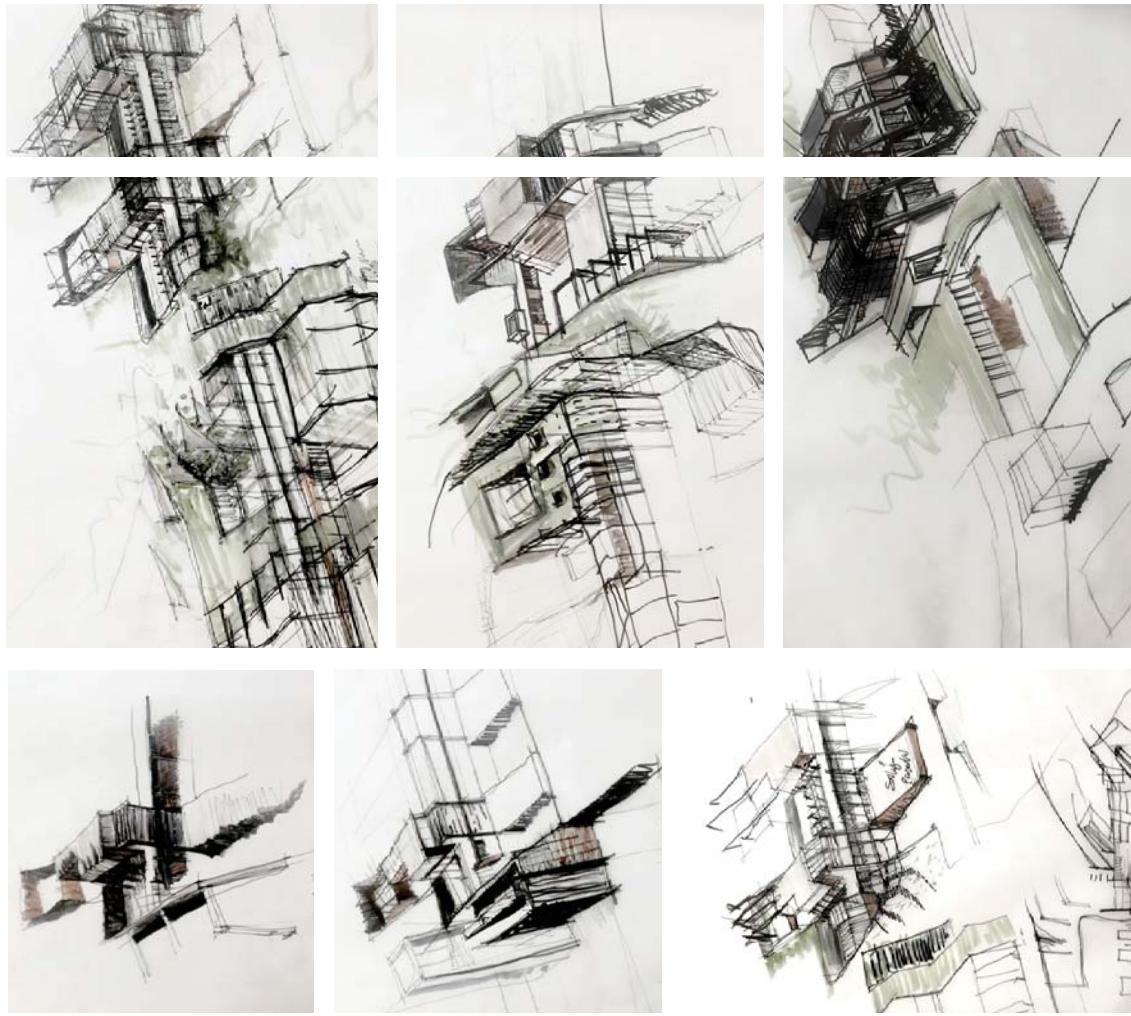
Iteration 02 plan sketch. (Author, 2018)
